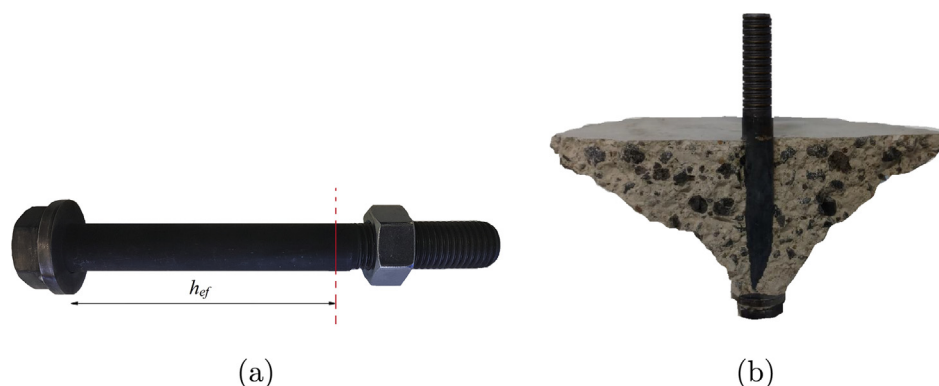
(a) Headed stud anchor type, and (b) typical concrete cone breakout.
